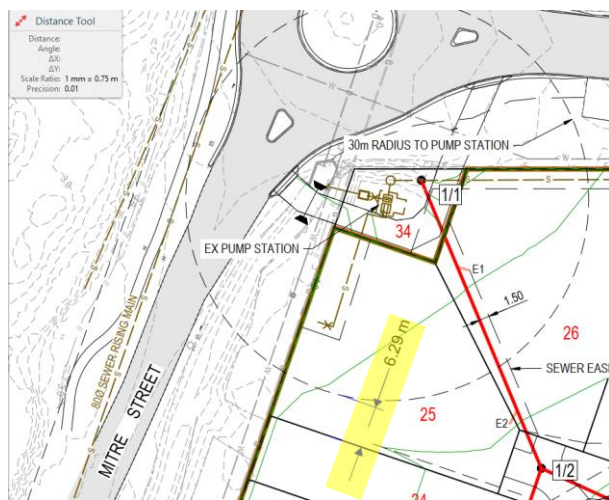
(a) Neon Drawing 501 (Sewerage Plan)
